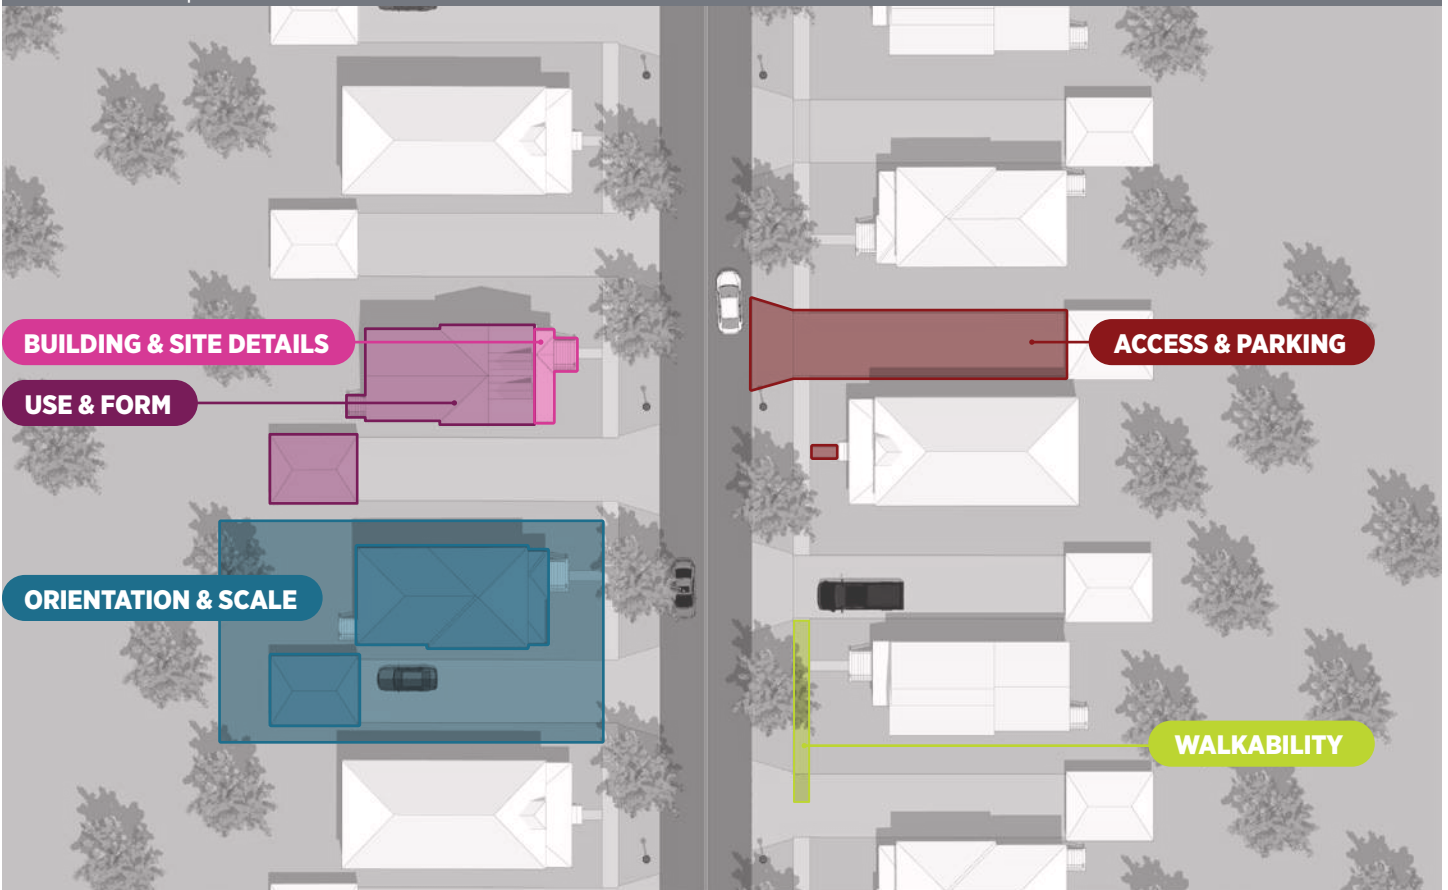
| HD RESIDENTIAL SITES - COMPOSITION PLAN VIEW
